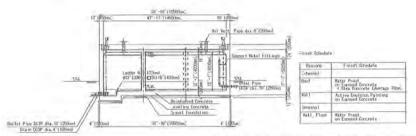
Proposed Plan of Malakal Service Tank
